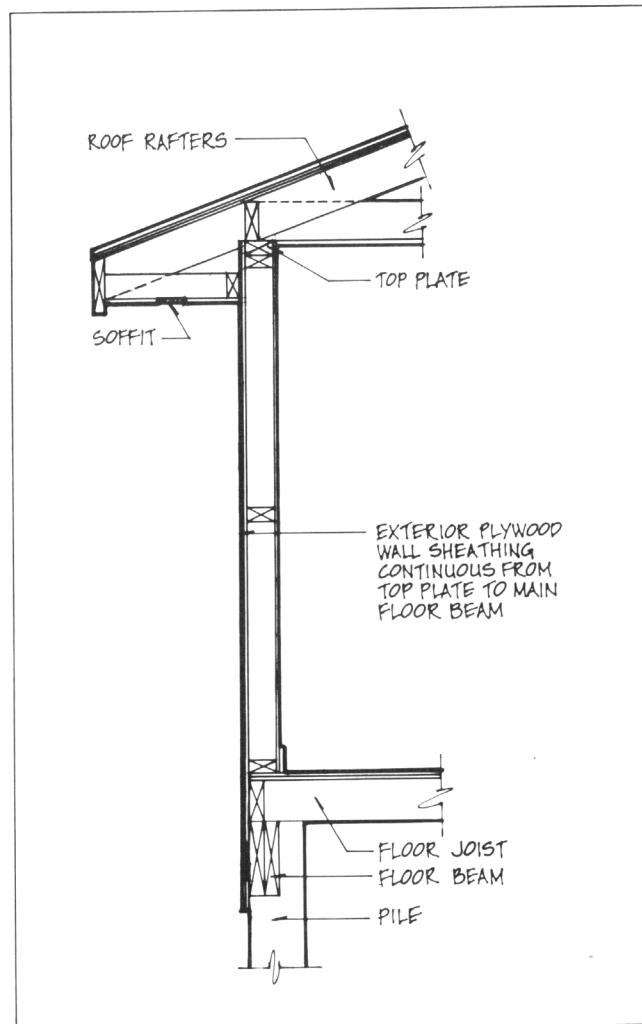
Wall Sheathing Tie from Roof to Ceiling
